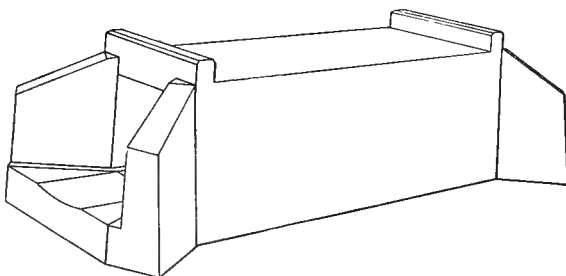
Perspective of Typical Reinforced Concrete Box Culvert shown in Figure 25.
